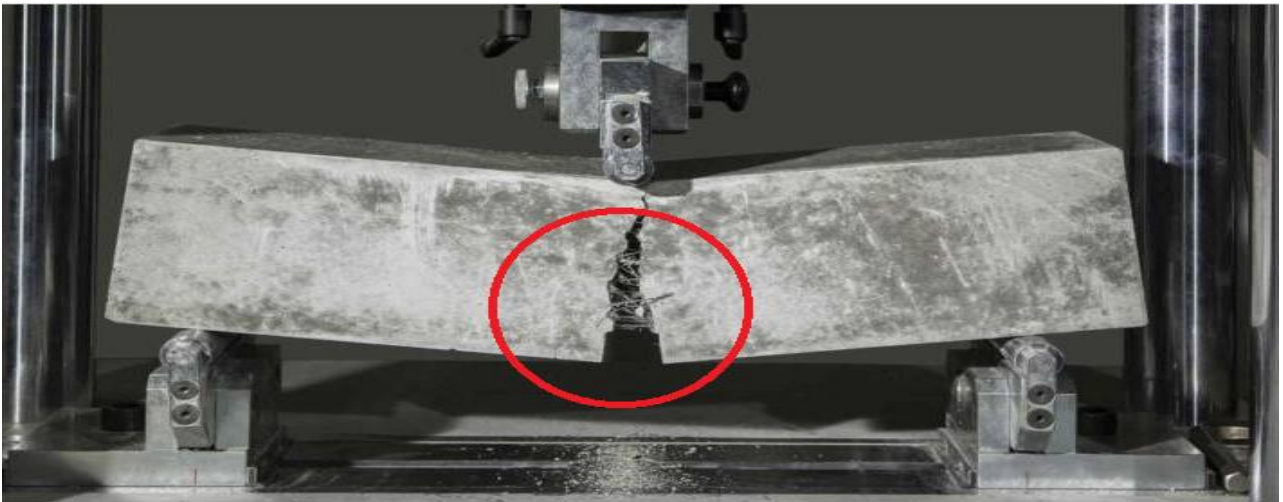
Fiber Reinforced Concrete (sikaconcrete.co.uk)
